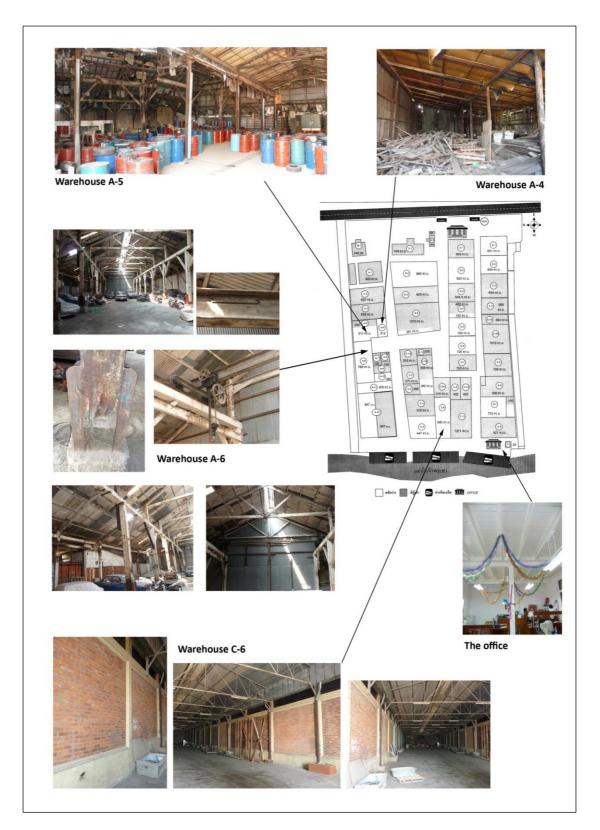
The interior of some buildings - The East Asiatic Co. Ltd, (Floor plan courtesy of Bangna Glass, all photos by author)
